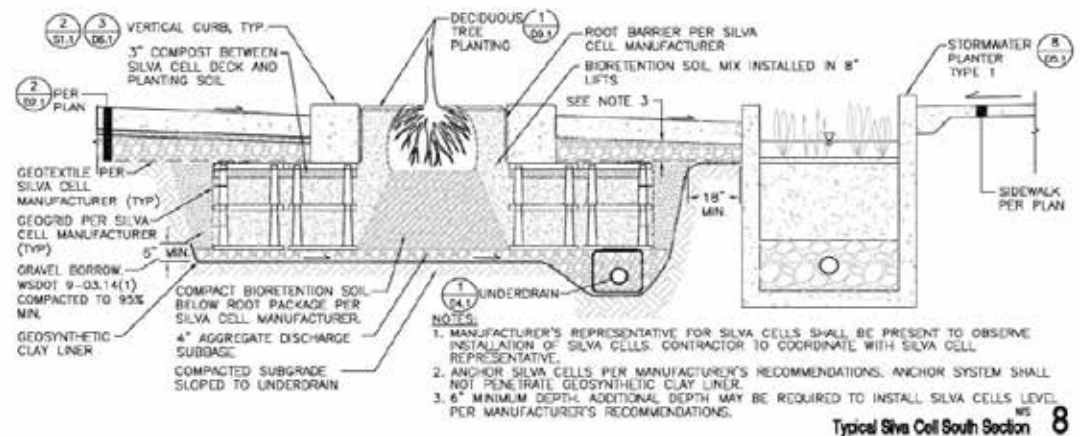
Details for a Suspended Pavement Silva Cell System with Stormwater Planters
